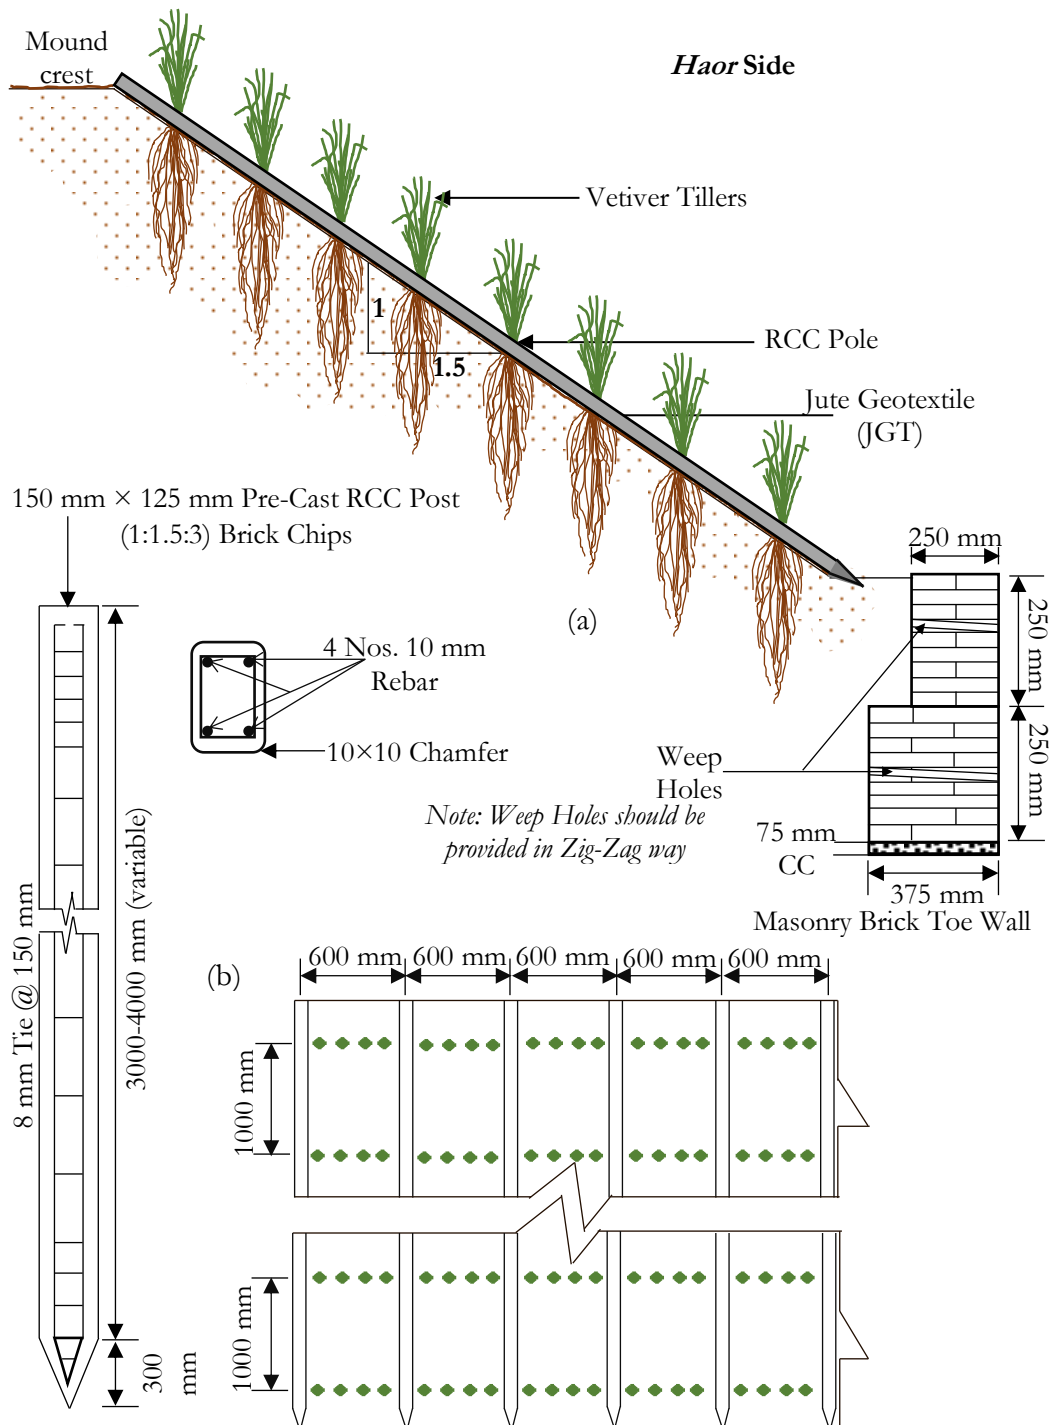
Schematic Drawing of Design Type IV, (a) Cross Sectional View; and (b) Plan View (Redrawn from HILIP, 2017)
